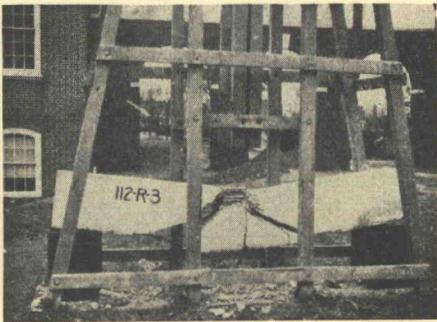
After Second Full Height Blow. Beam reinforced with one $\frac{1}{2}$ -in. round rail steel bar.
